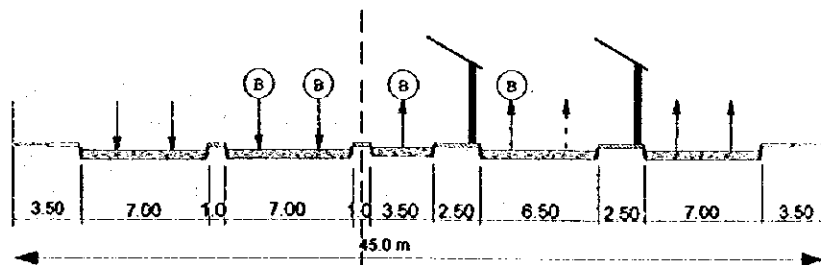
Minimum Cross Section for Trunk Bus System by At-grade Road Type
